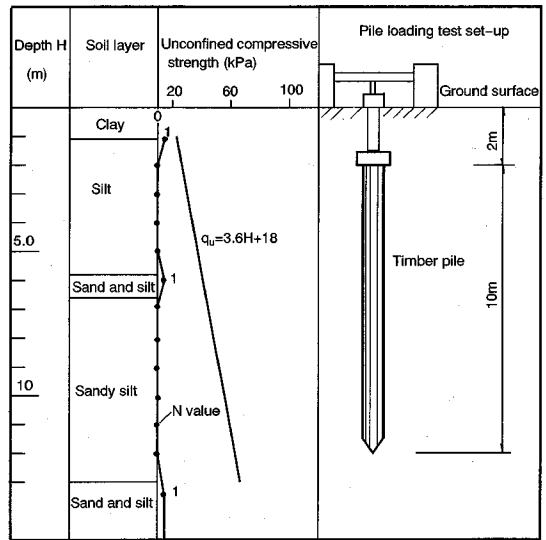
Profile of subsoil in the test site and the pile loading test set-up (test I)
